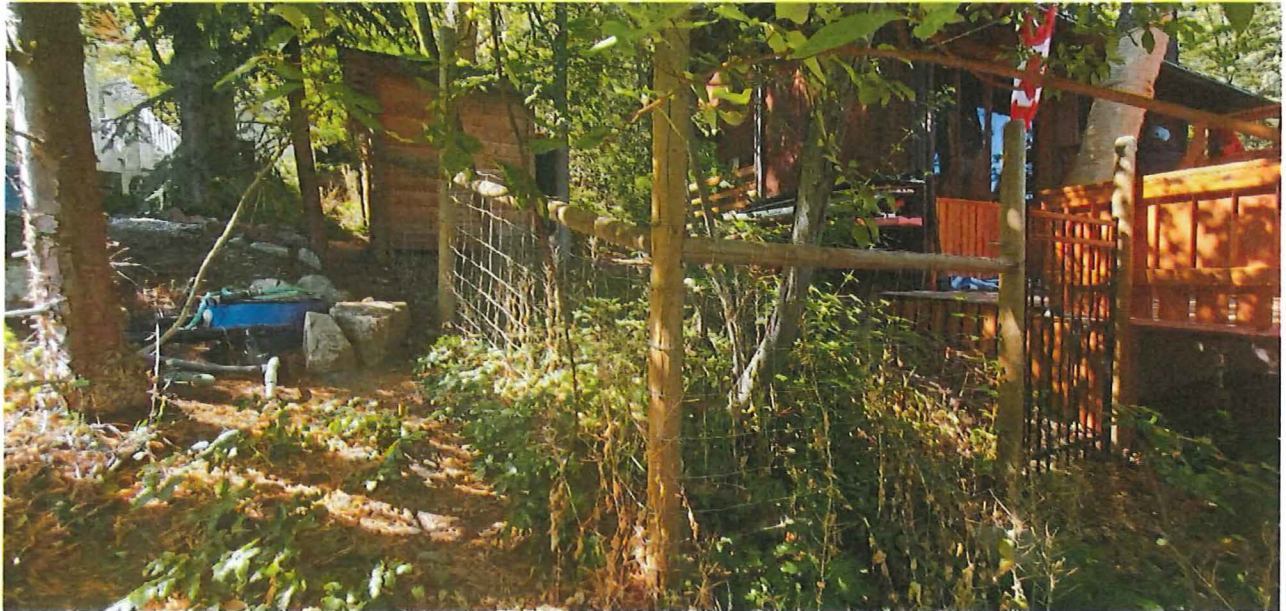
Looking at – entrance to upper deck area, and south roof and downspout
